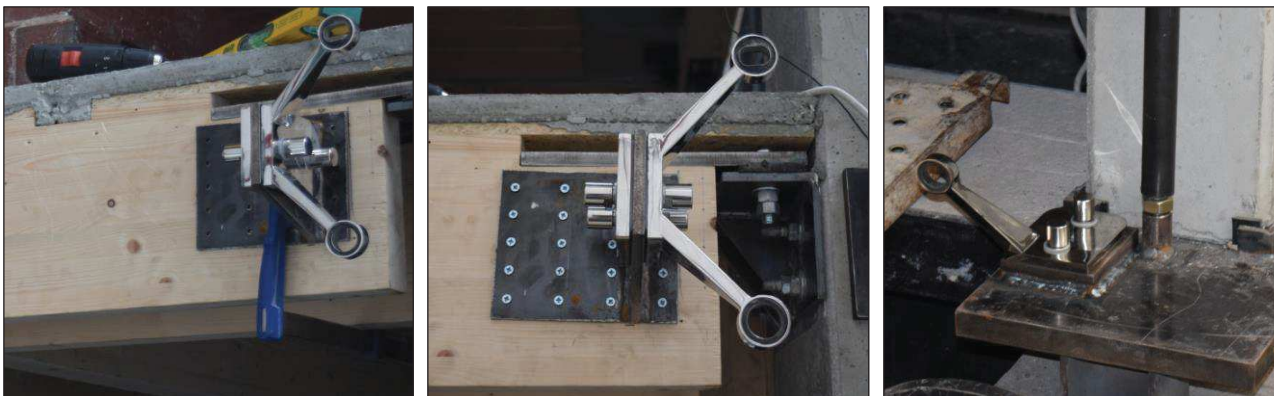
Construction of the glass wall: positioning of the steel plate/spider connector assembly (left); fixing of the steel assembly using screws (centre); welding of the base plate to the foundation (right).
